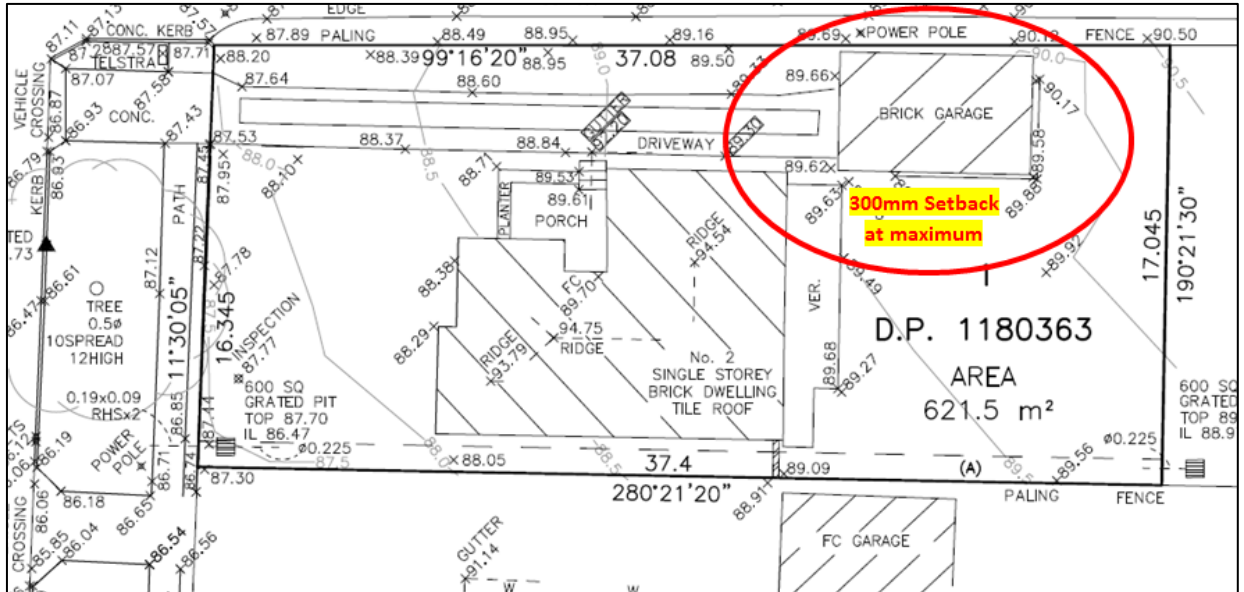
Existing outbuilding setback, at No. 2 Orange Street (As measured from survey)
